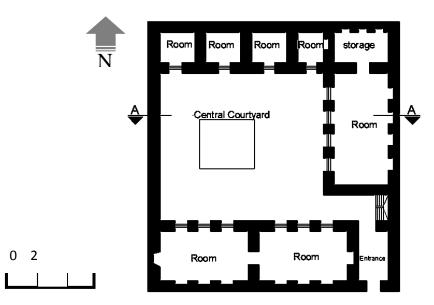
Ground-floor plan of a traditional building in Bushehr (Memarian, 2006)
